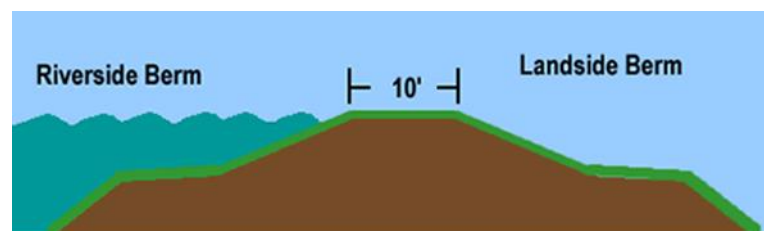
Cross-section of a typical levee showing flat crest and riverside and landside slopes
